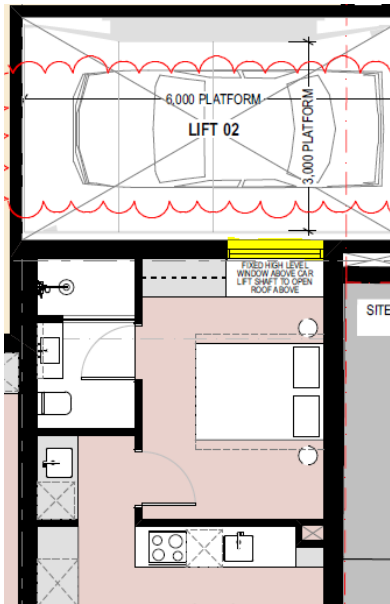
excerpt from Ground Floorplan of the Decision Plans, window of G.02 highlighted in yellow
